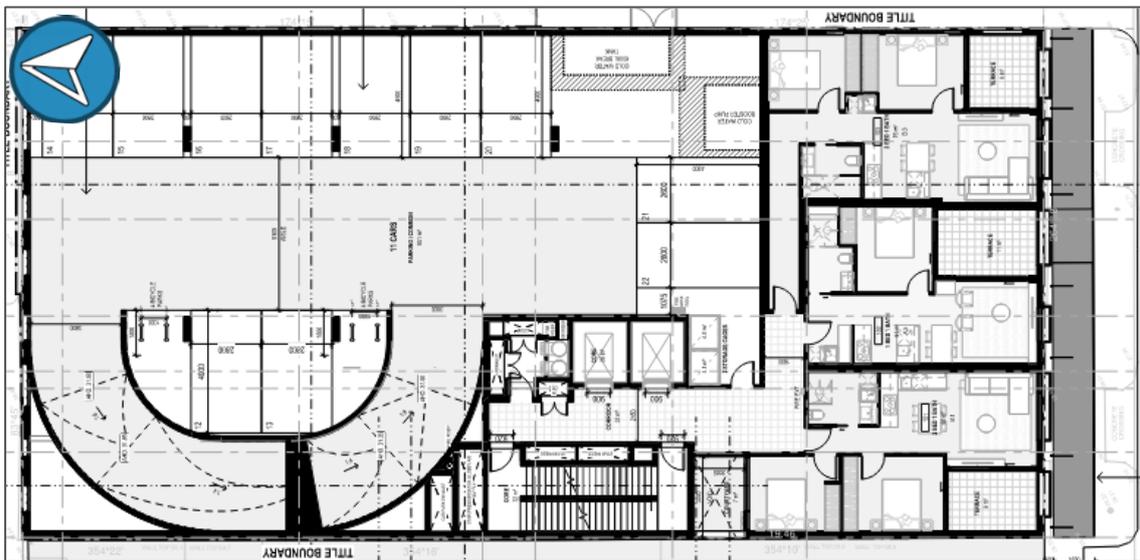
Proposed Level 01 Plan (Image Source: Cera Stribley)
